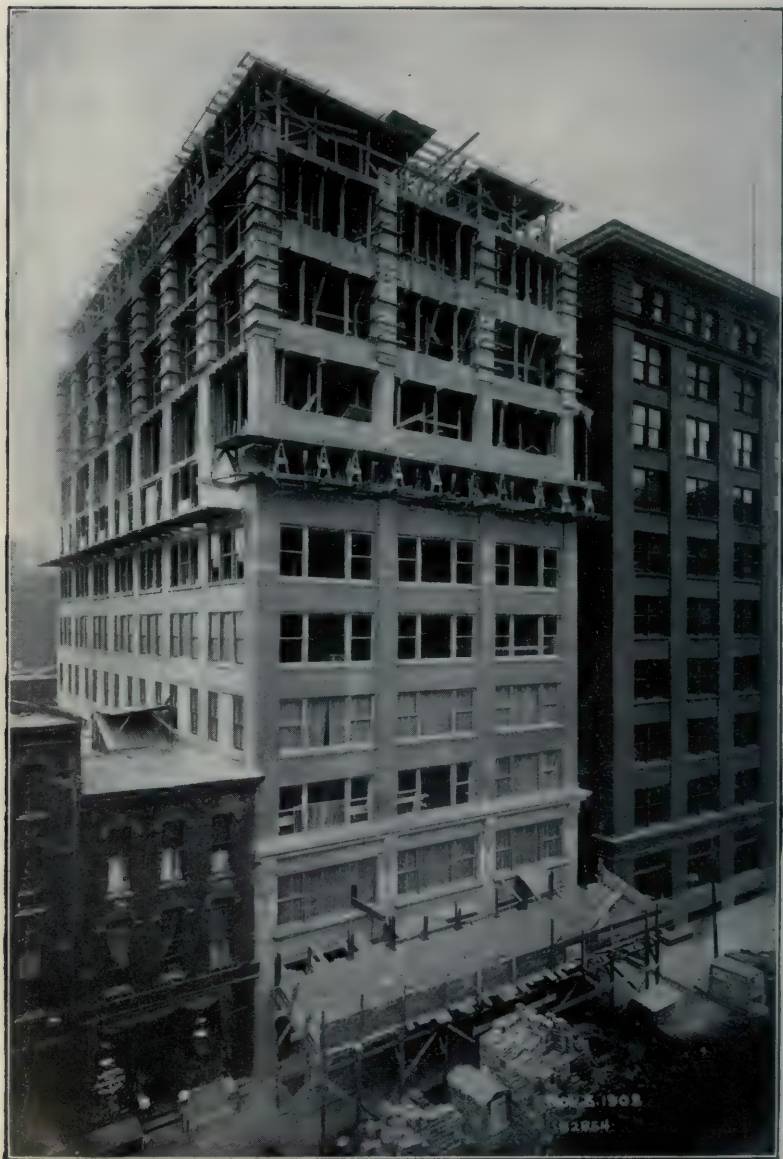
Fig. F. Mercantile building for M. Born, Chicago, Ill. Holabird & Roche, architects. Alling Construction Co., builders. Mushroom System.
